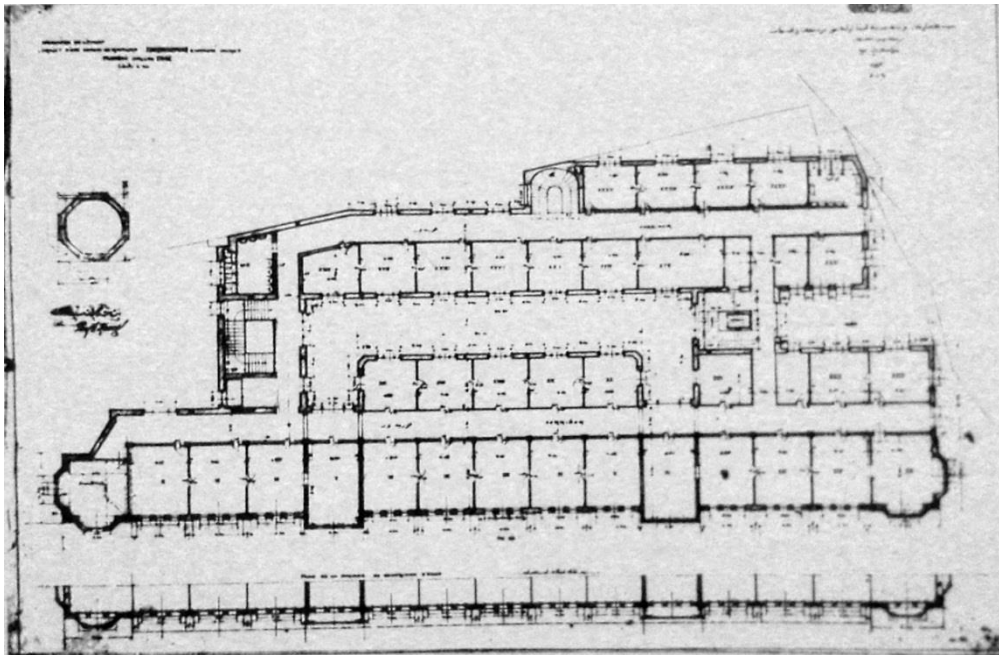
Kemaleddin Bey: Plan of Dördüncü Vakıf Han.
